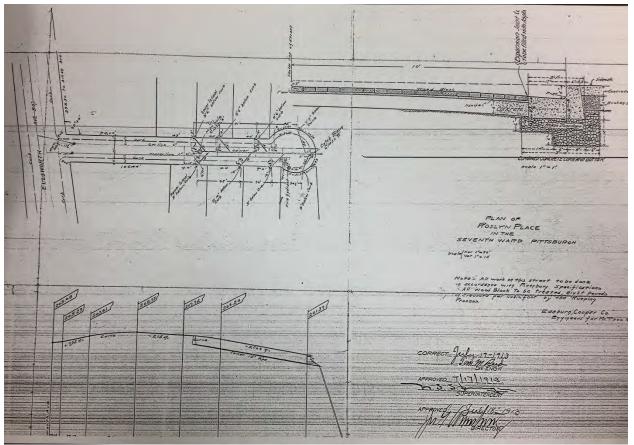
The Plan of Roslyn Place in the Seventh Ward Pittsburgh. 1913. Provided by Pittsburgh's Department of Public Works.
